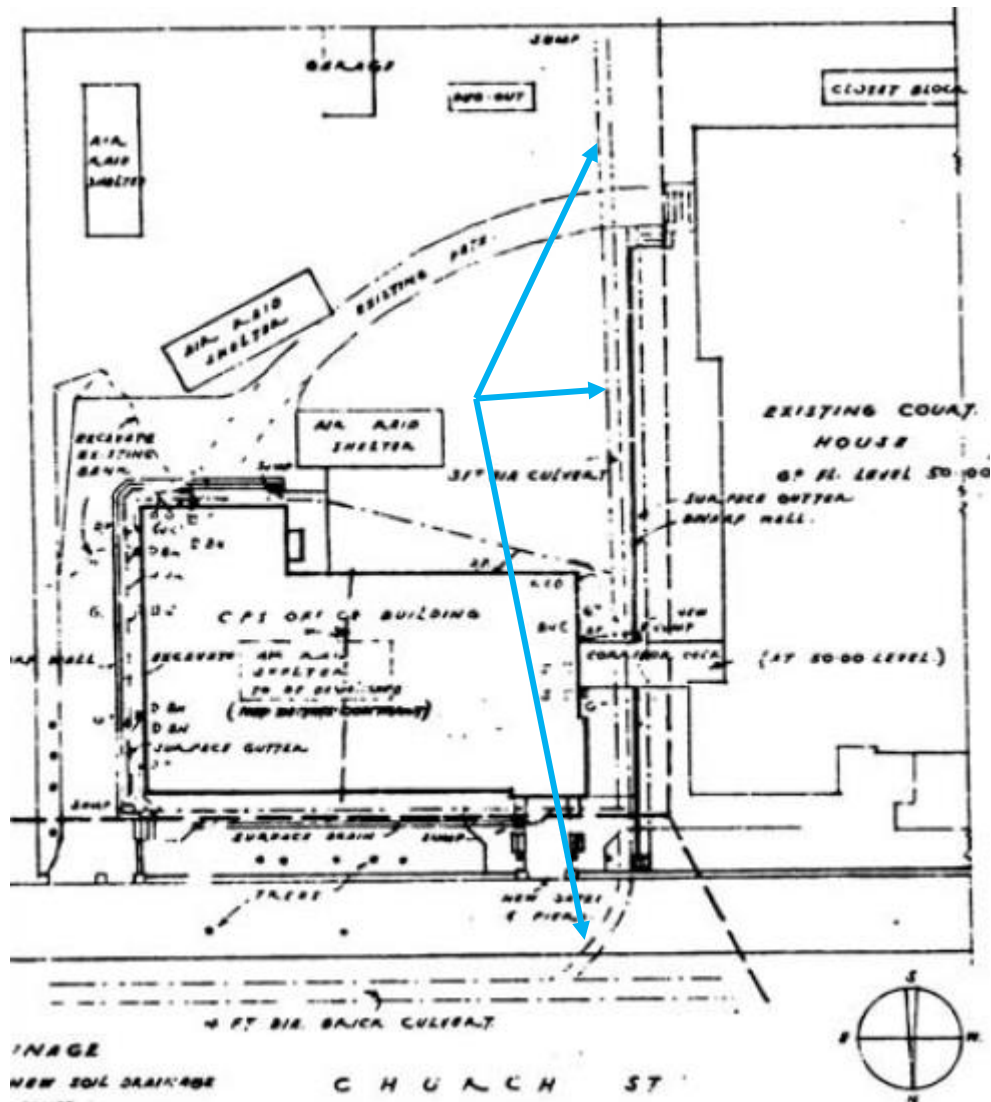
Copy of a post 1949 plan showing the completed east building as well as location of the post-1861 below ground brick-lined culvert (blue arrow).
